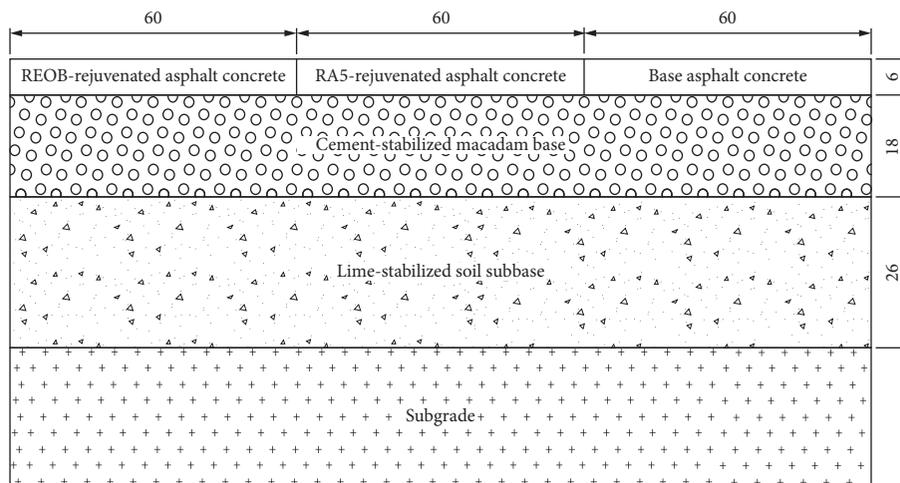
Structural sketch of full-scale indoor test road (cm).
